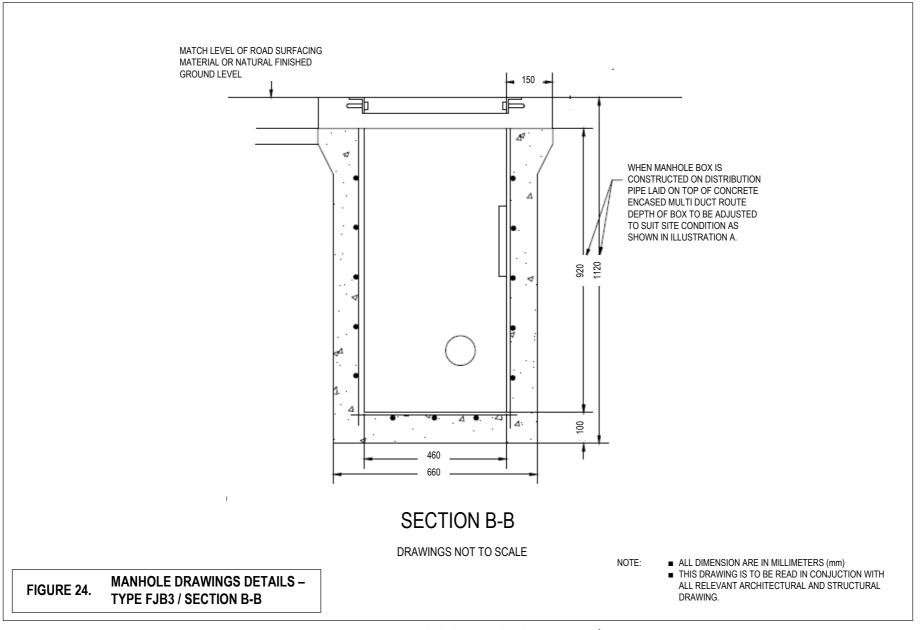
Manhole drawings details – Type FJB3 / section B-B
